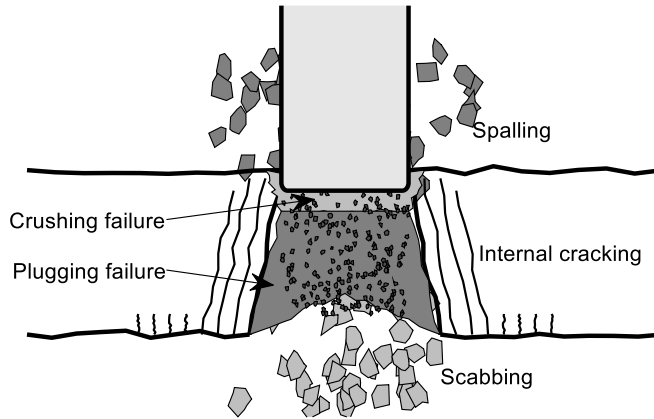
High-speed penetration failure of a concrete slab. Figure adapted from (Q. M. Li et al., 2005).
